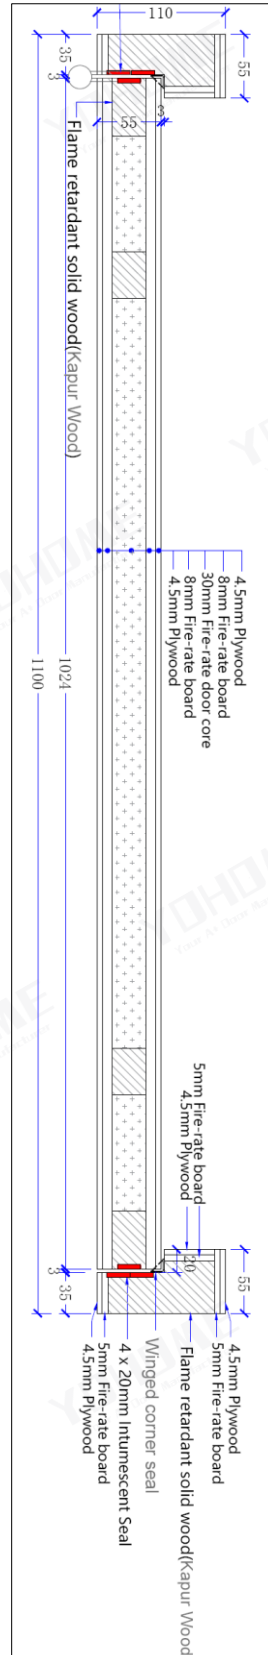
ins wooden fire door and frame, Model YH-02
